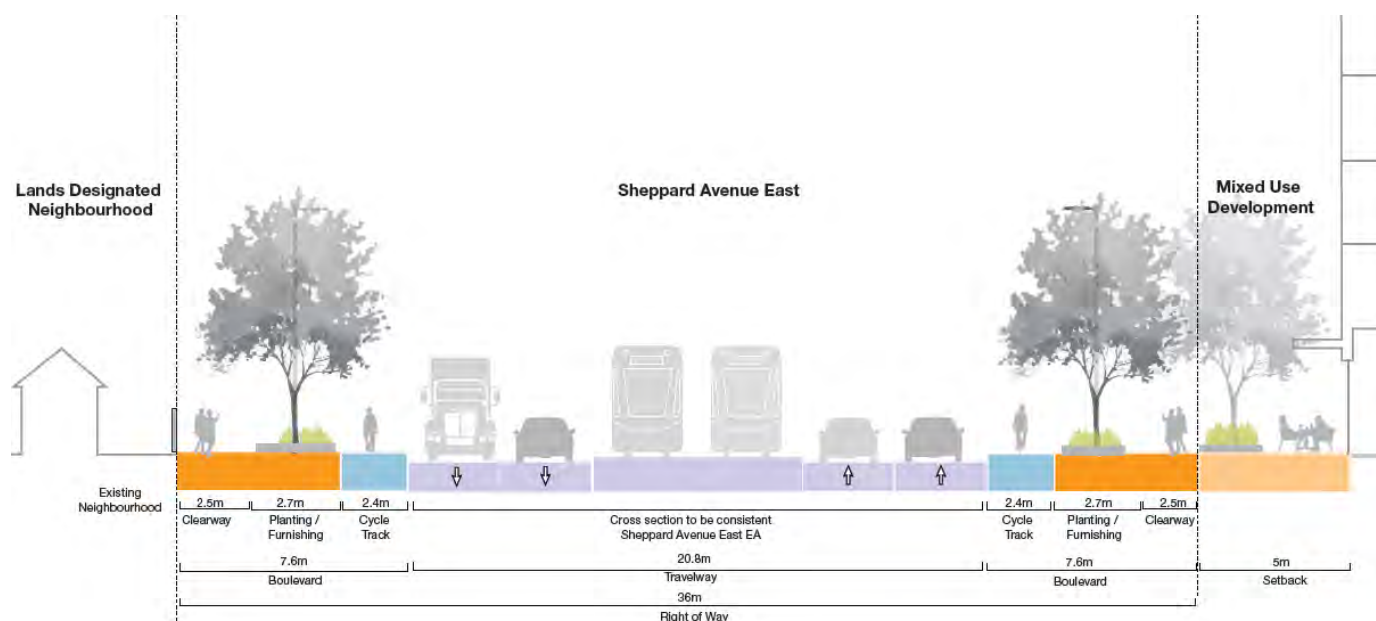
Sheppard Avenue Preferred Cross-section
